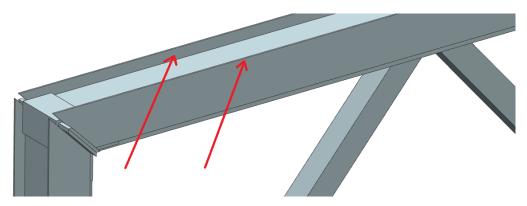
Walkaway fixing proposal: Top Beams' flanges
